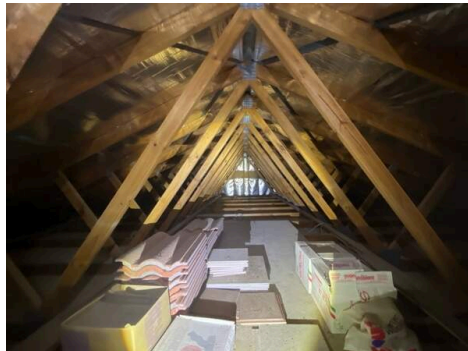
The roof is trussed construction with sarking beneath the tiles and insulation to the ceiling sheeting.
